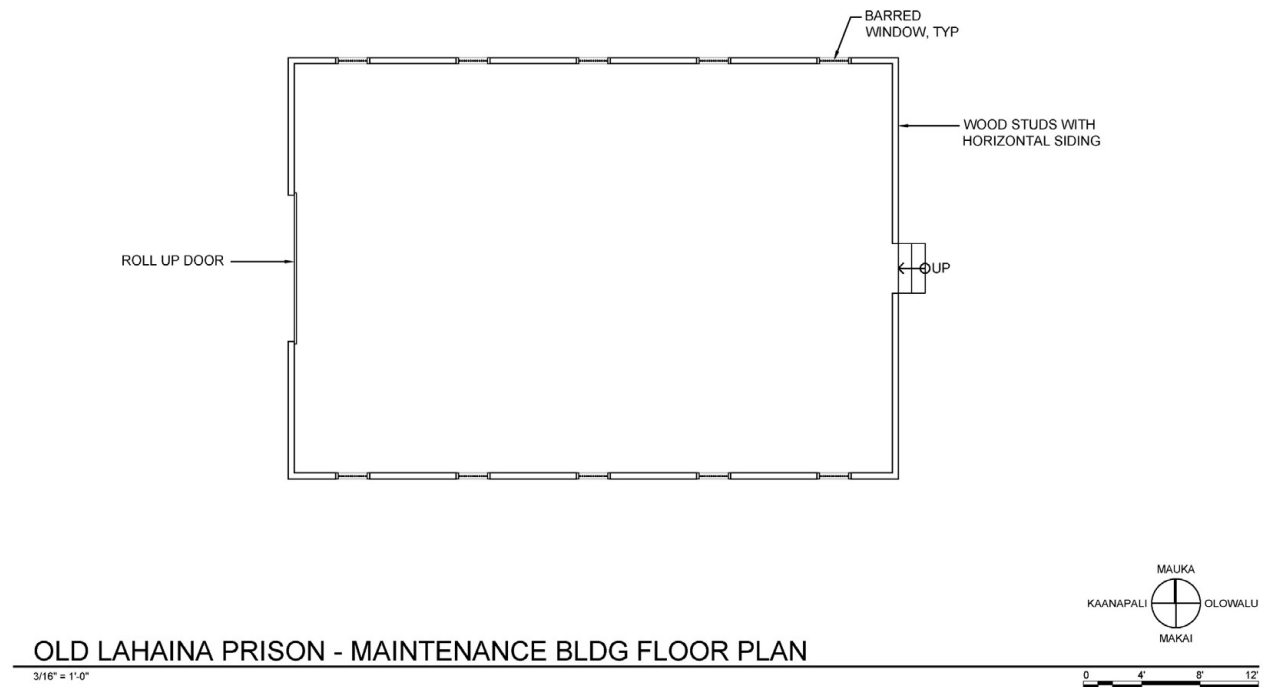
Old Lahaina Prison Cell Block 2 (Maintenance Building) Floor Plan.
